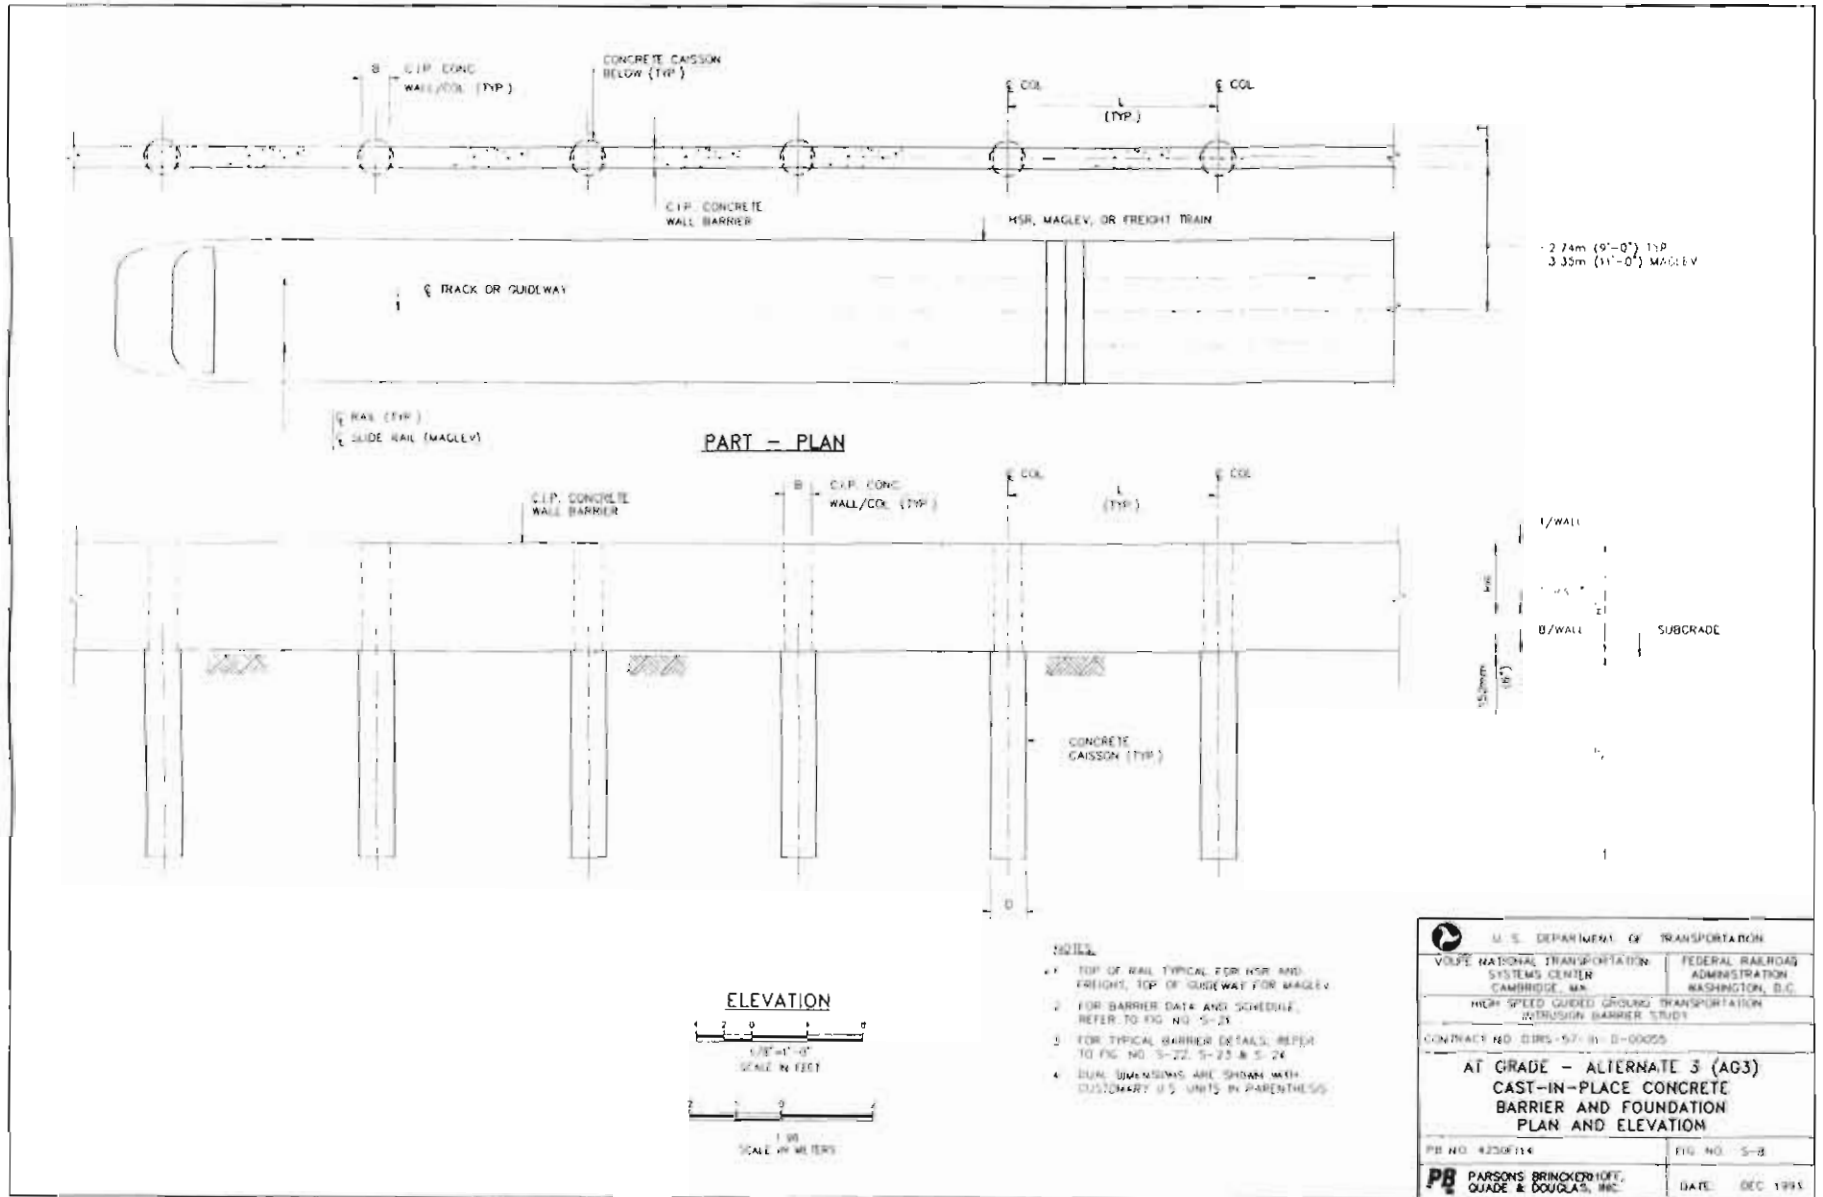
AT GRADE ALTERNATE 3: CAST-IN-PLACE (C.I.P.) CONC. WALL AND C.I.P. FOUNDATION - PLAN AND ELEVATION
